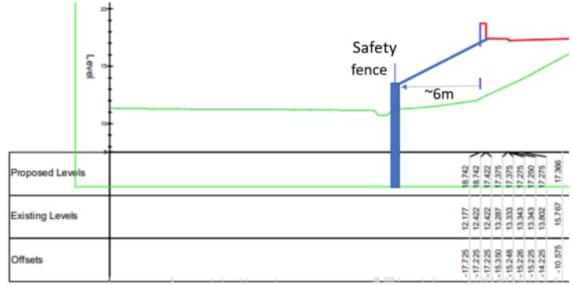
Proposed toe sheet pile wall at Ch.140 approximately 6m away from 3C alignment
